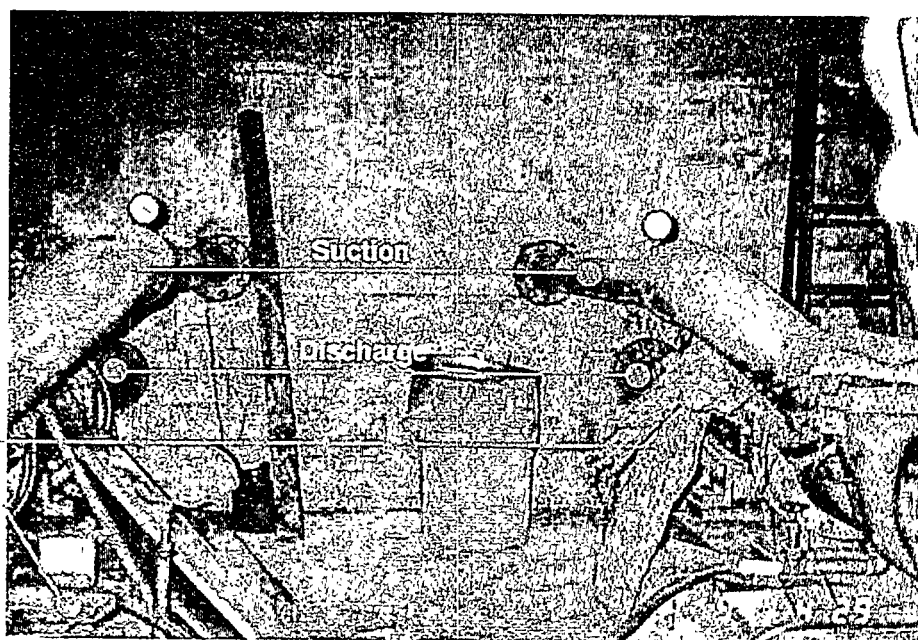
West interior wall of pump house between pump suction lines.
